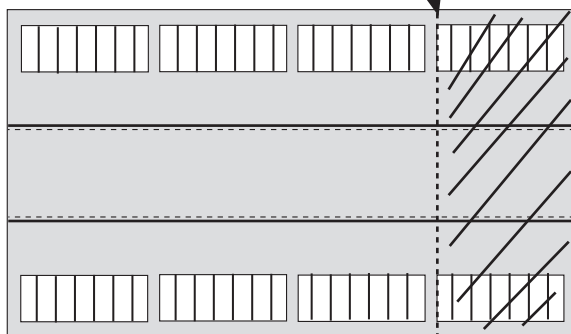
THE BRIDGE WALLS & FLOOR.
